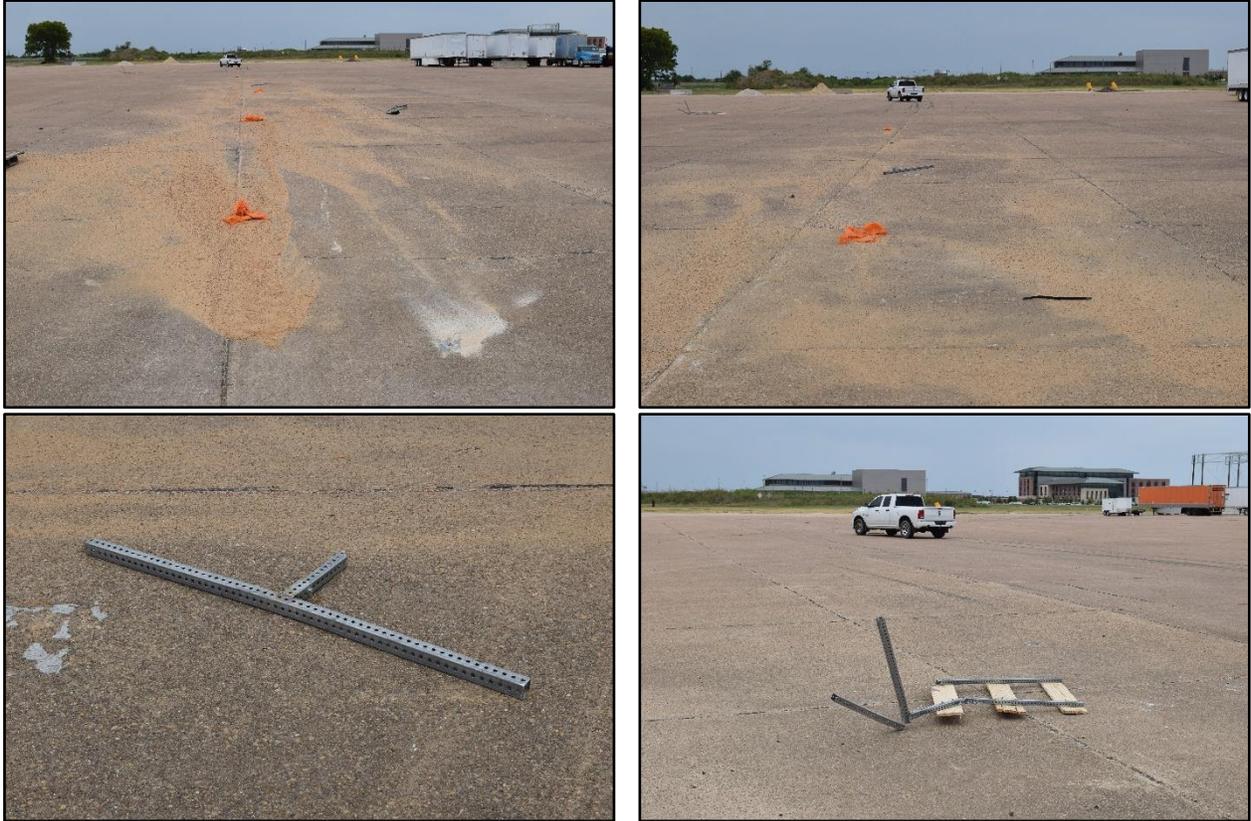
Type III Barricade after Test No. 469469-12-02.
